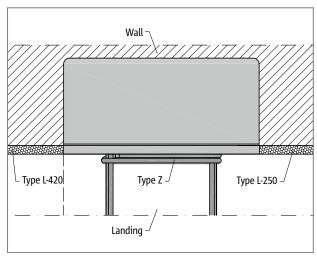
Schöck Tronsole® type Z: Element configuration, Detail A
